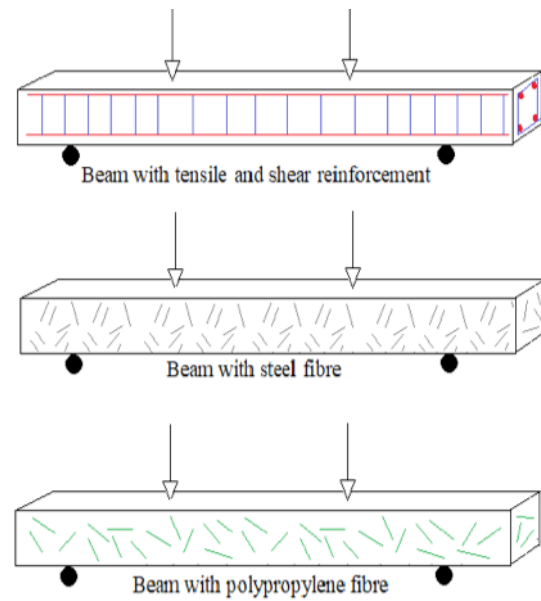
Typical beam specimens (700x150x150mm) with different reinforcements subjected to two point loading at L/3 span as per ASTM C78
